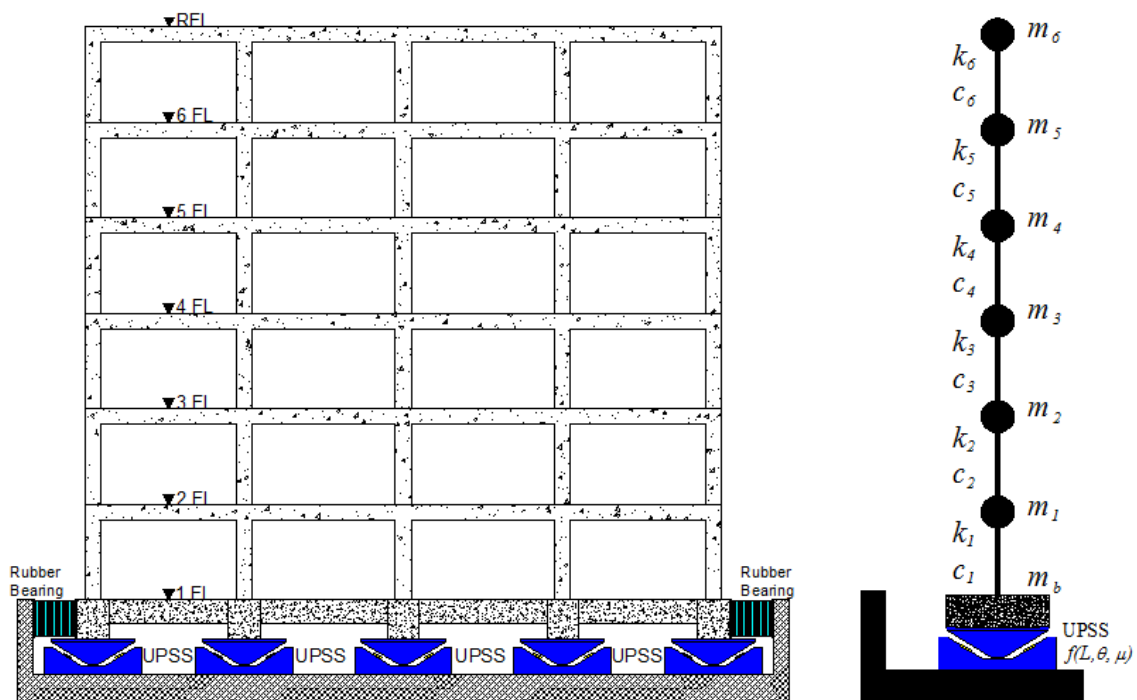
Elevation view of six-story reinforced concrete shear frame and the lumped mass model
